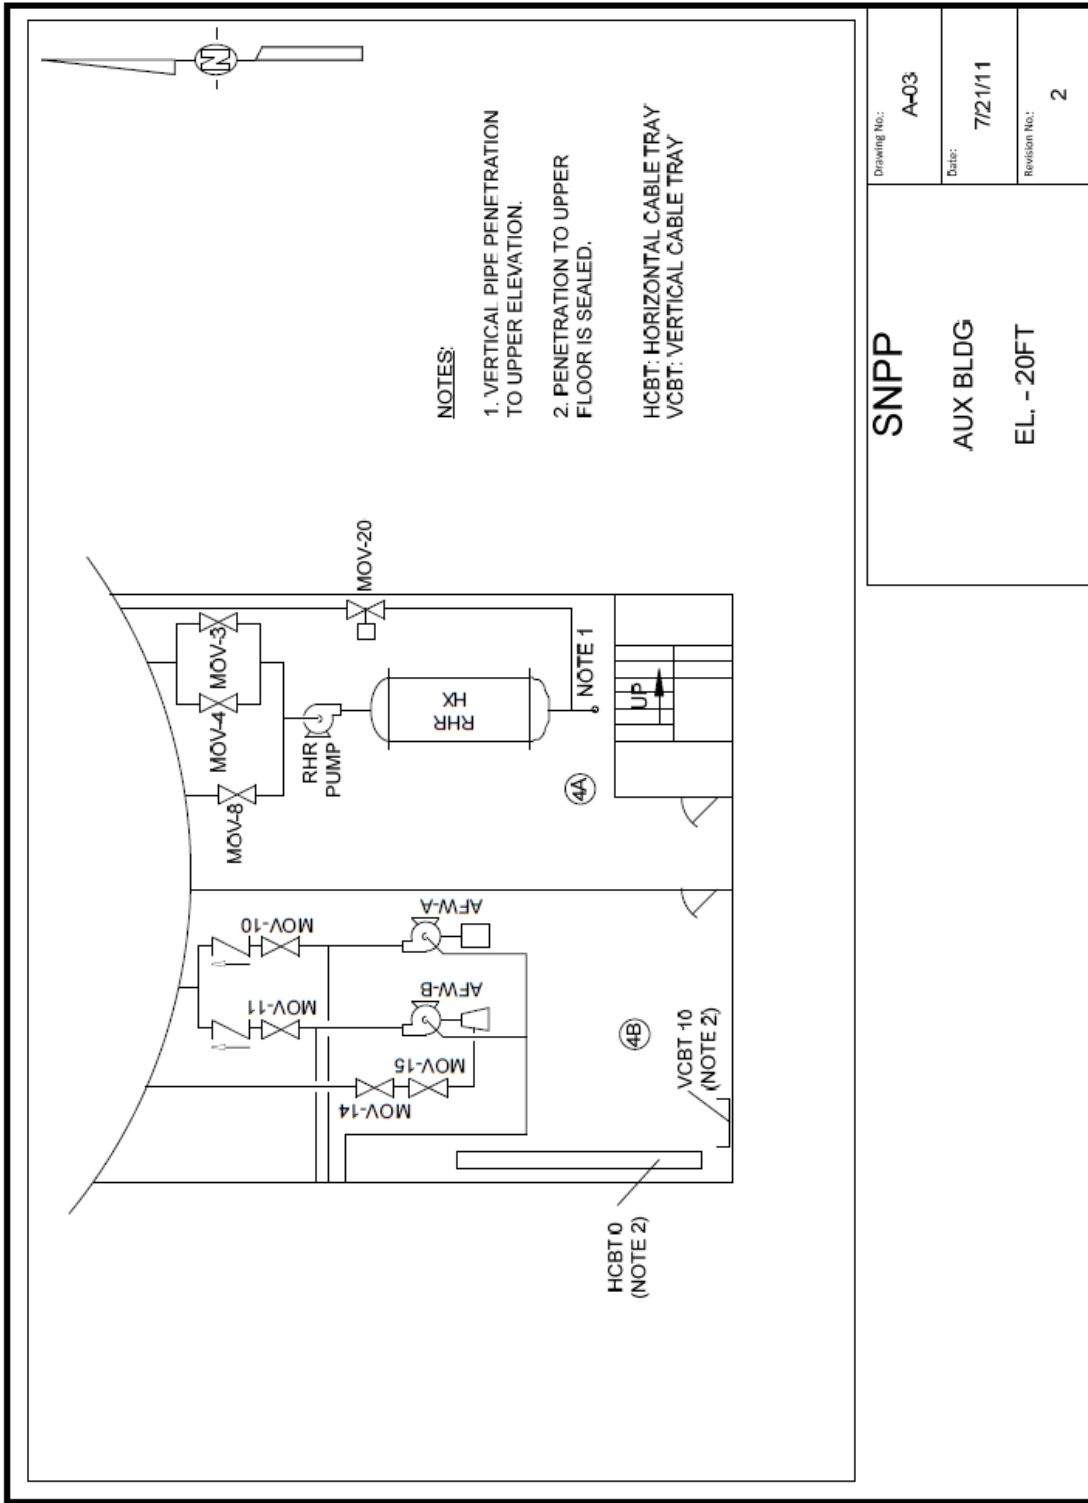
Auxiliary Building - Elevation 20 Ft.
